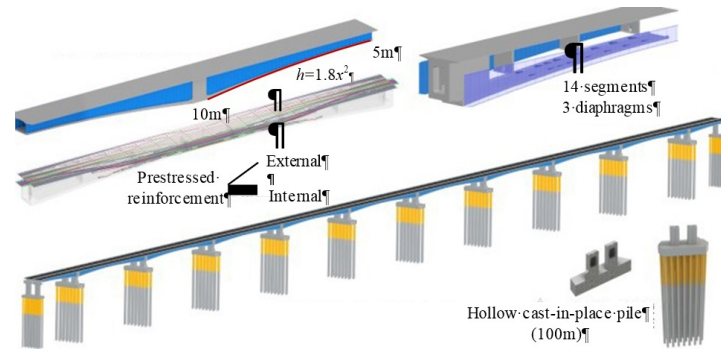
Three-dimensional diagram of the prestressed concrete continuous girder with CSWs of Zhao-Jun Yellow River Super Large Bridge. CSW, corrugated steel webs
